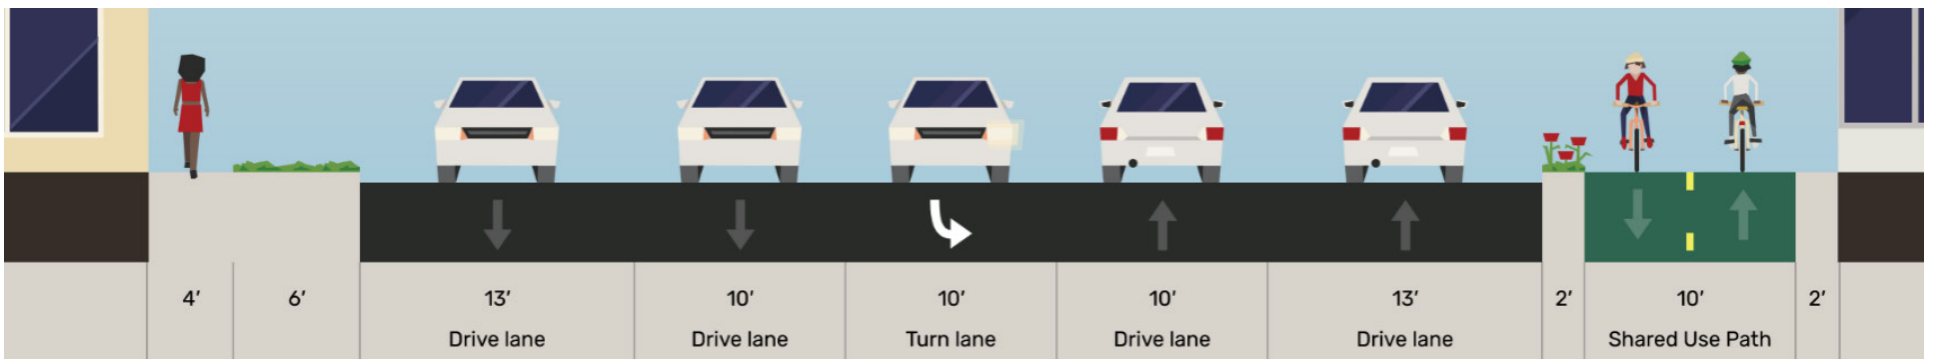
Proposed cross-section: Marine Ave from Prairie Ave to Gerkin Ave
